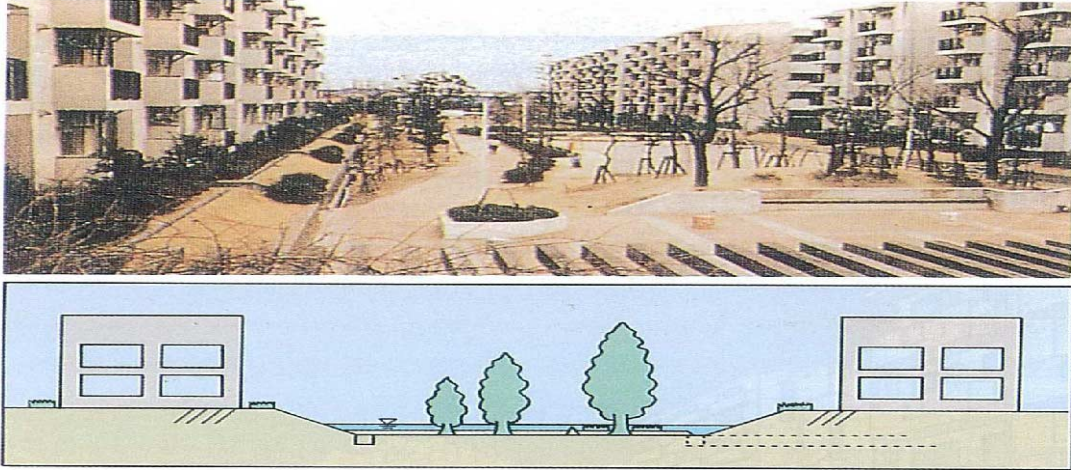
Sample of Stormwater Retention Facility (Apartment Building)
